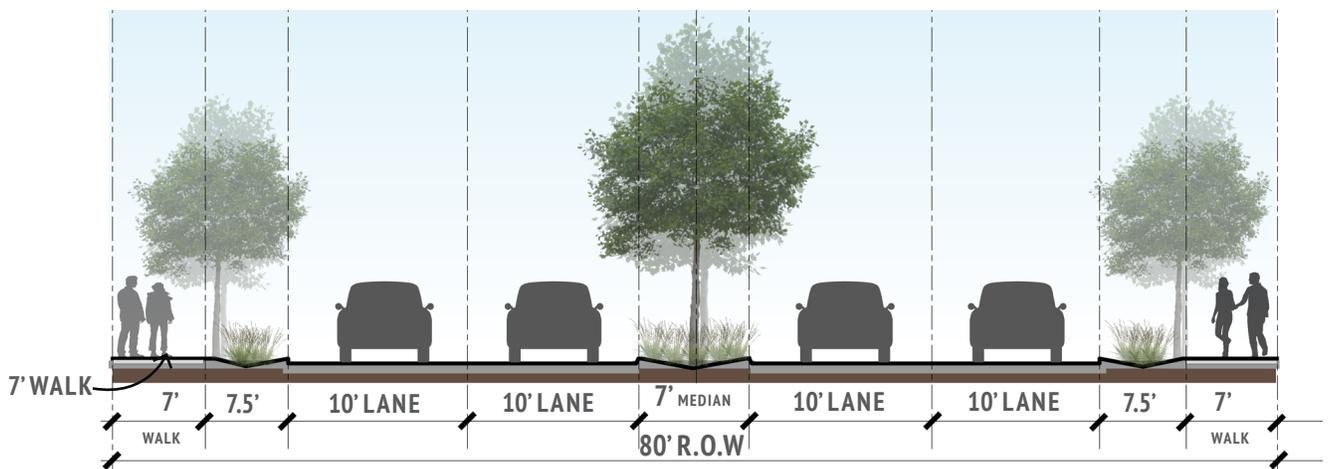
■ TYPICAL SECTION - STREET TYPE C
